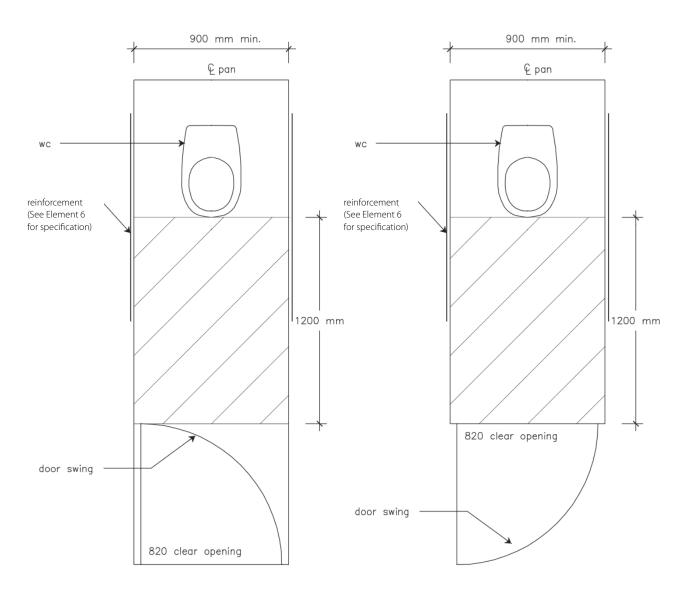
(a) Silver level ground (or entry) level toilet layout and space requirements in a separate room.
